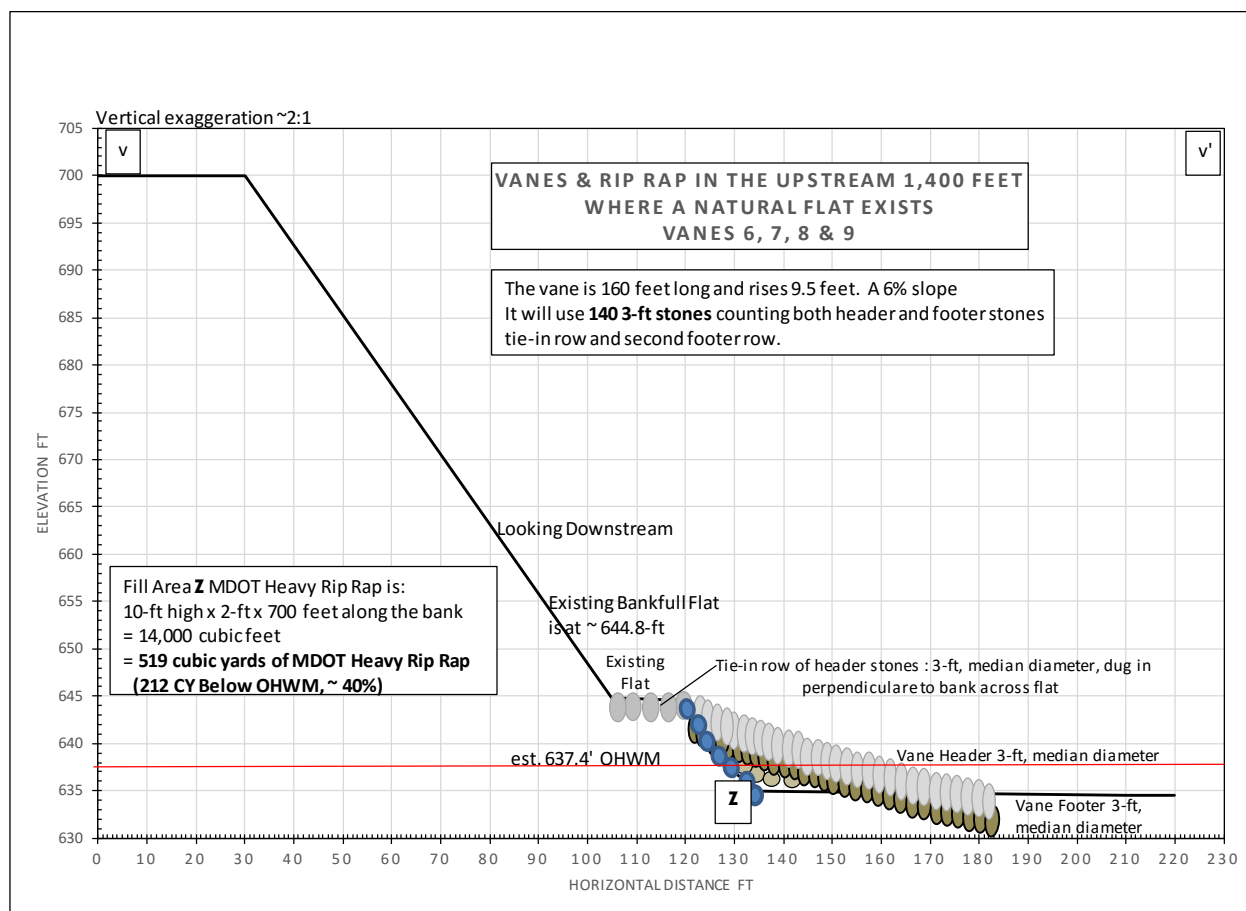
Cross section u-u' showing vane 6 attached to an existing bank flat. This is typical for vanes 6 through 9.
